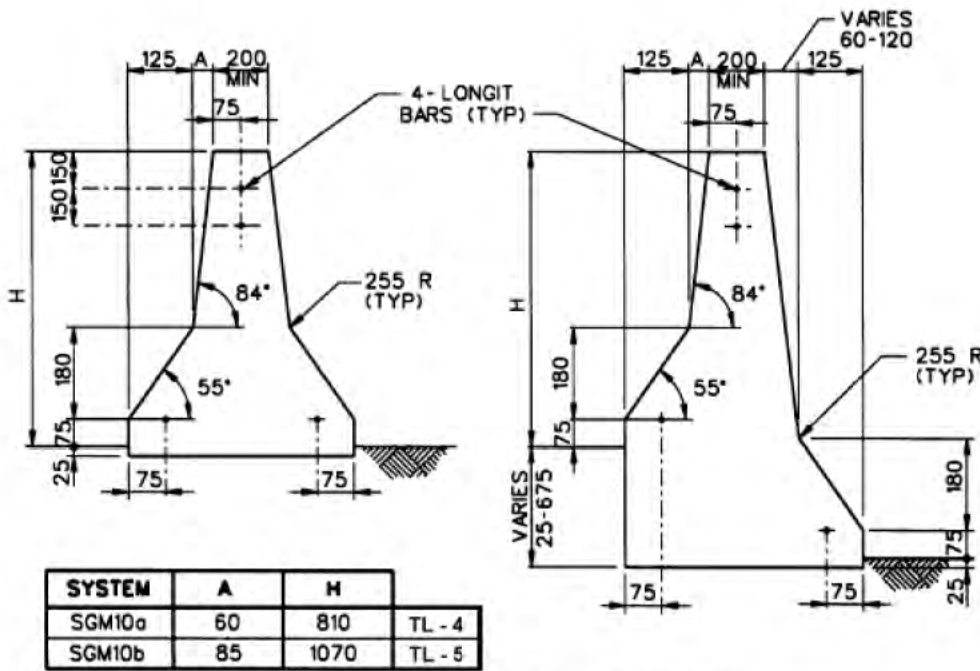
F-Shape Concrete Barrier Detail from NZTA M23A
